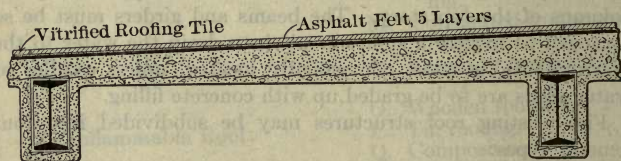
Concrete Roof Construction, U. S. Public Building, Los Angeles.
